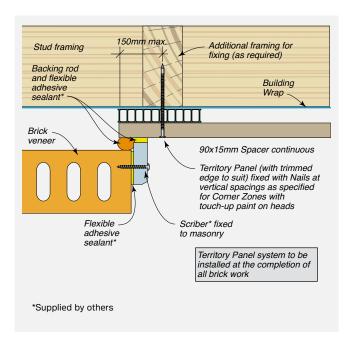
Typical Abutment – Panel to Brick Veneer – Plan View
